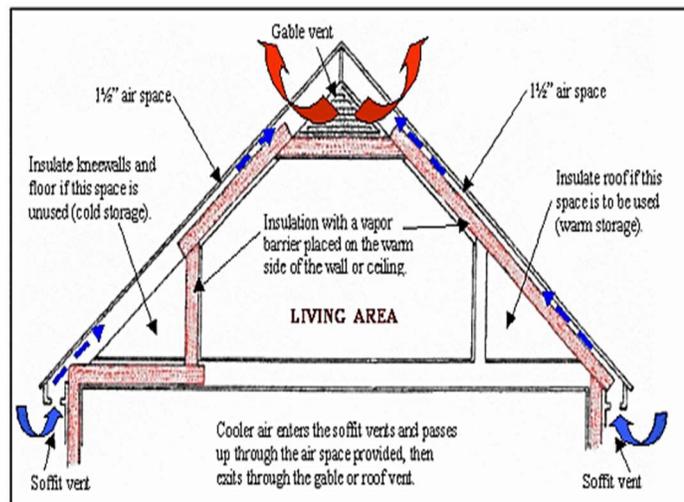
Proper method of insulating and ventilating a typical 1 1/2 story
